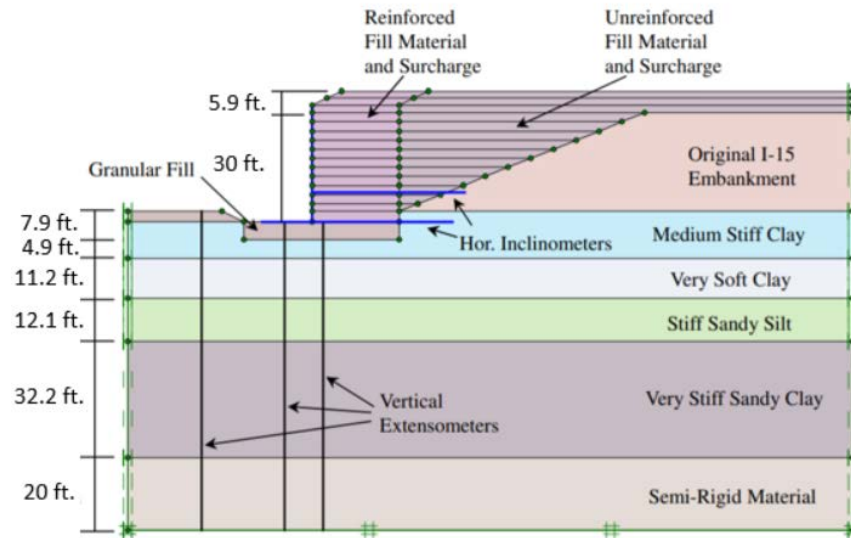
MSE wall cross-section and instrumentations (Budge et al. 2006)
